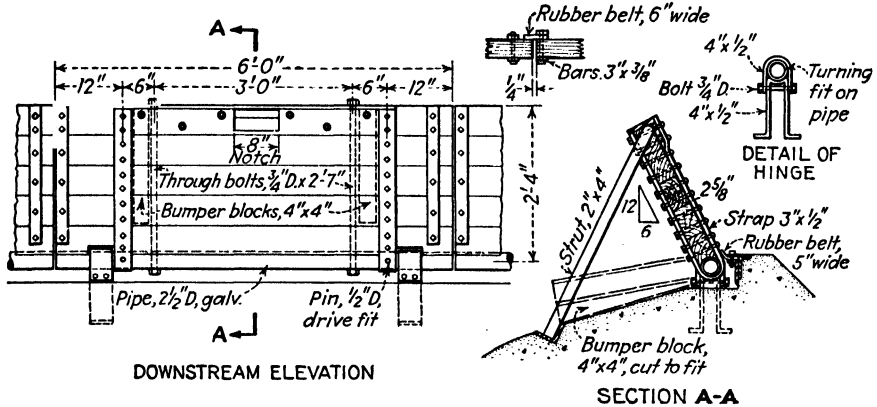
Two-foot hinged flashboards. (Designed by Fargo Engineering Company.)
